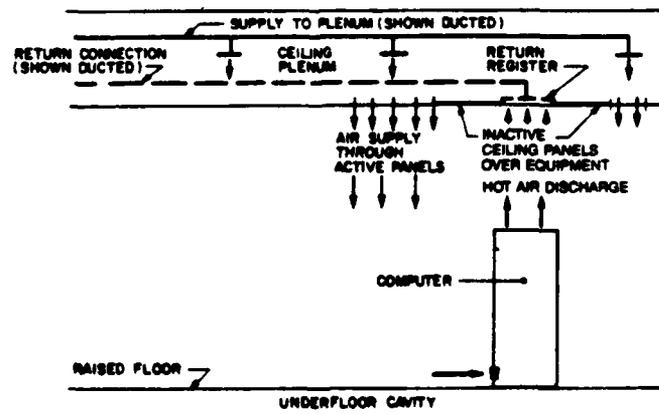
Ceiling plenum supply. (Source: ASHRAE Handbook [1987], Chapter 33. Used with permission.)
